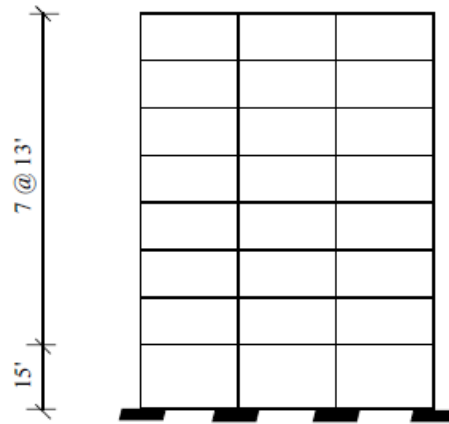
Elevation view of the 3 bays of the perimeter frame building
